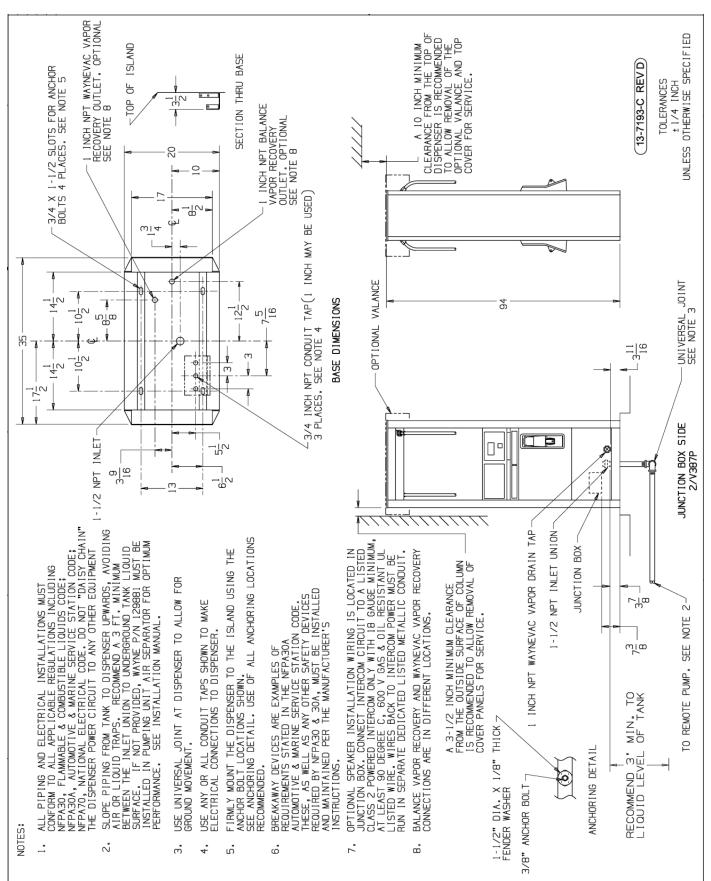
13-7193-C Installation Instructions - 4/V387P (Suction)
